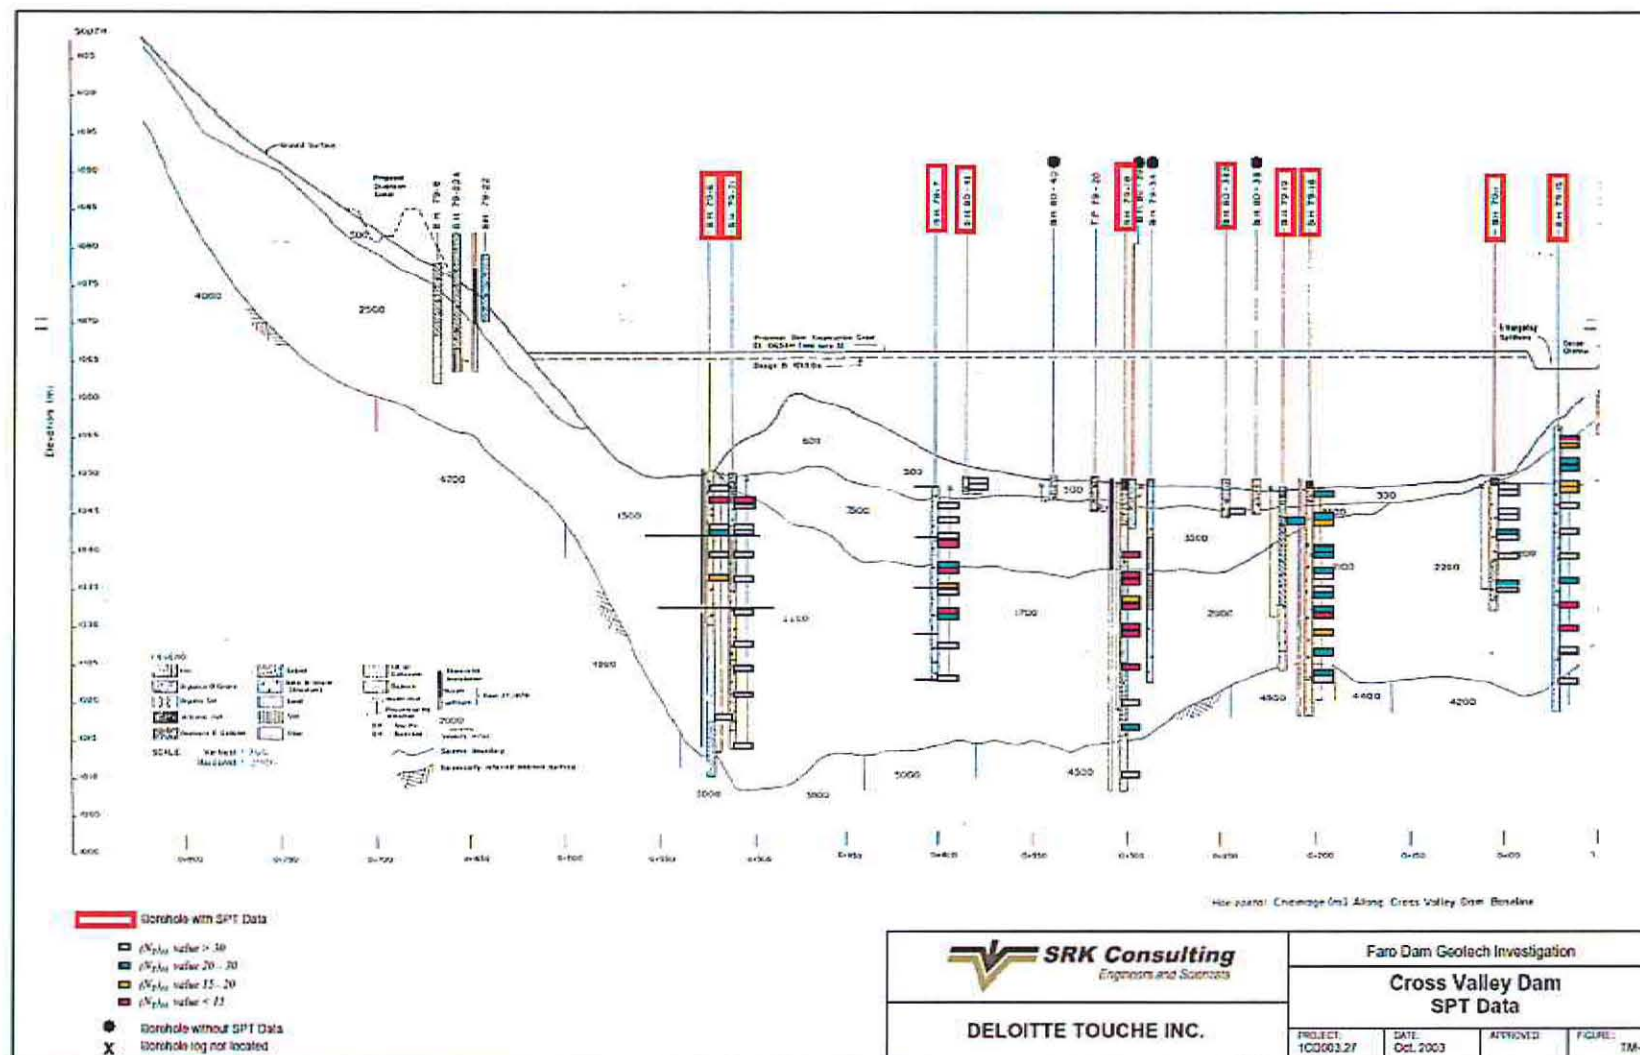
Longitudinal section of Cross Valley Dam foundation along with drilled boreholes position
